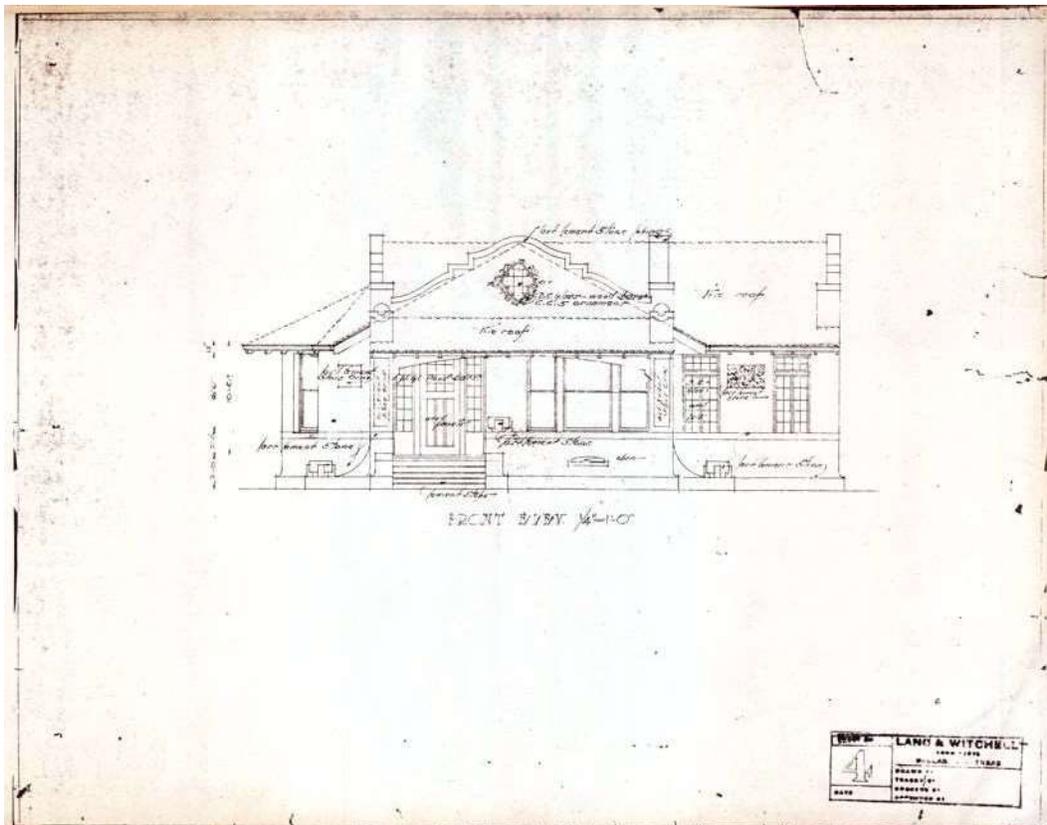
Original Lang and Witchell Front (Southeast) Elevation – Sheet 4
